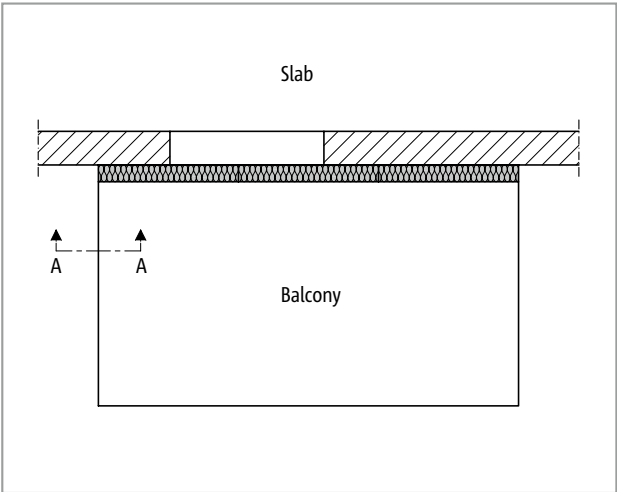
Schöck Isokorb® XT type K: Representation of the position of the cross-section A-A
